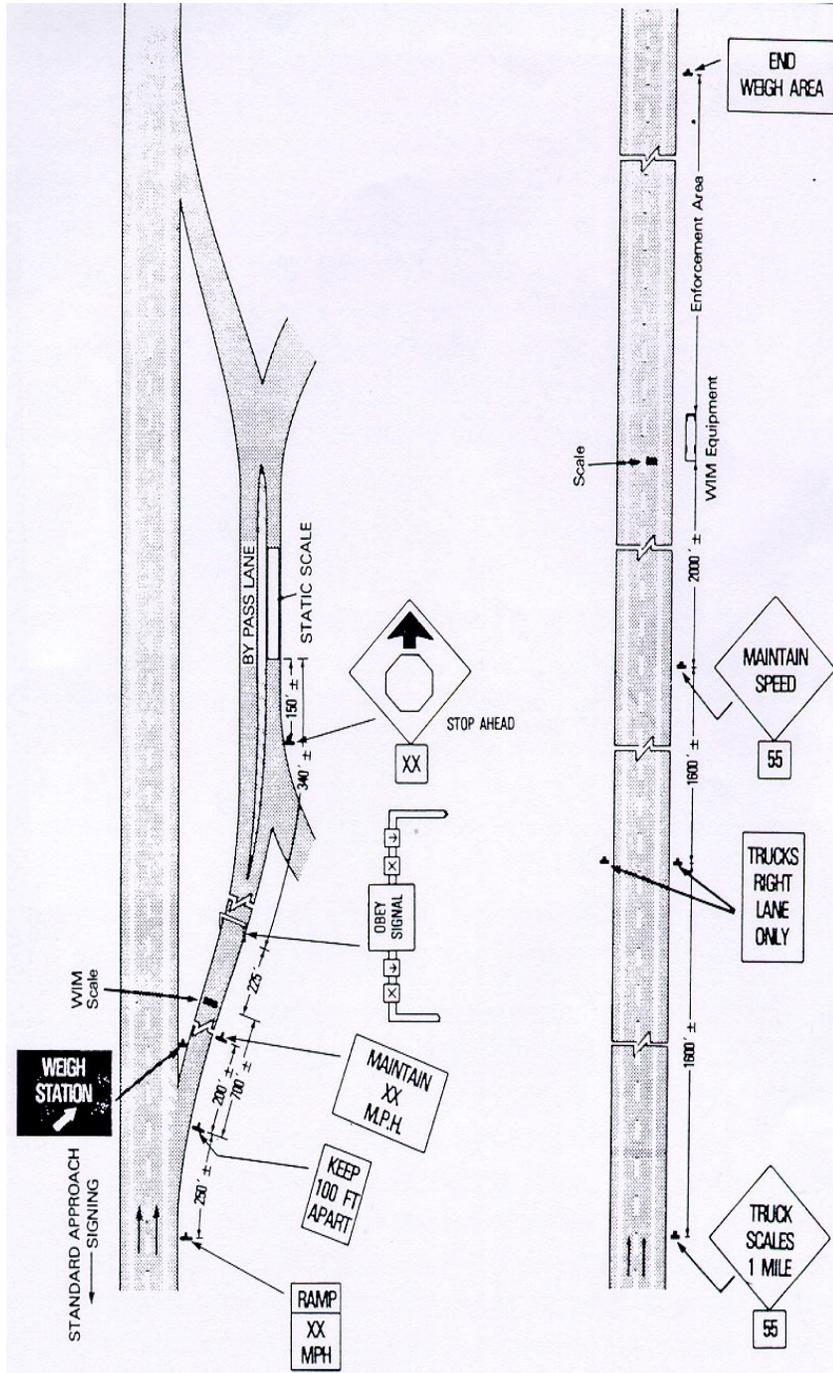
Typical geometric layout for WIM stations (Ref 10)
